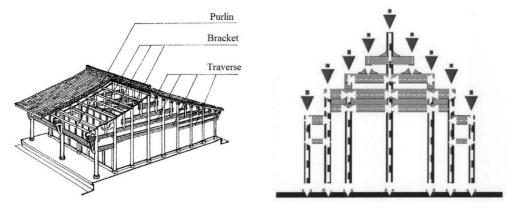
Schematic and Loading Transferring Path of Traverse-bracket frame structure
